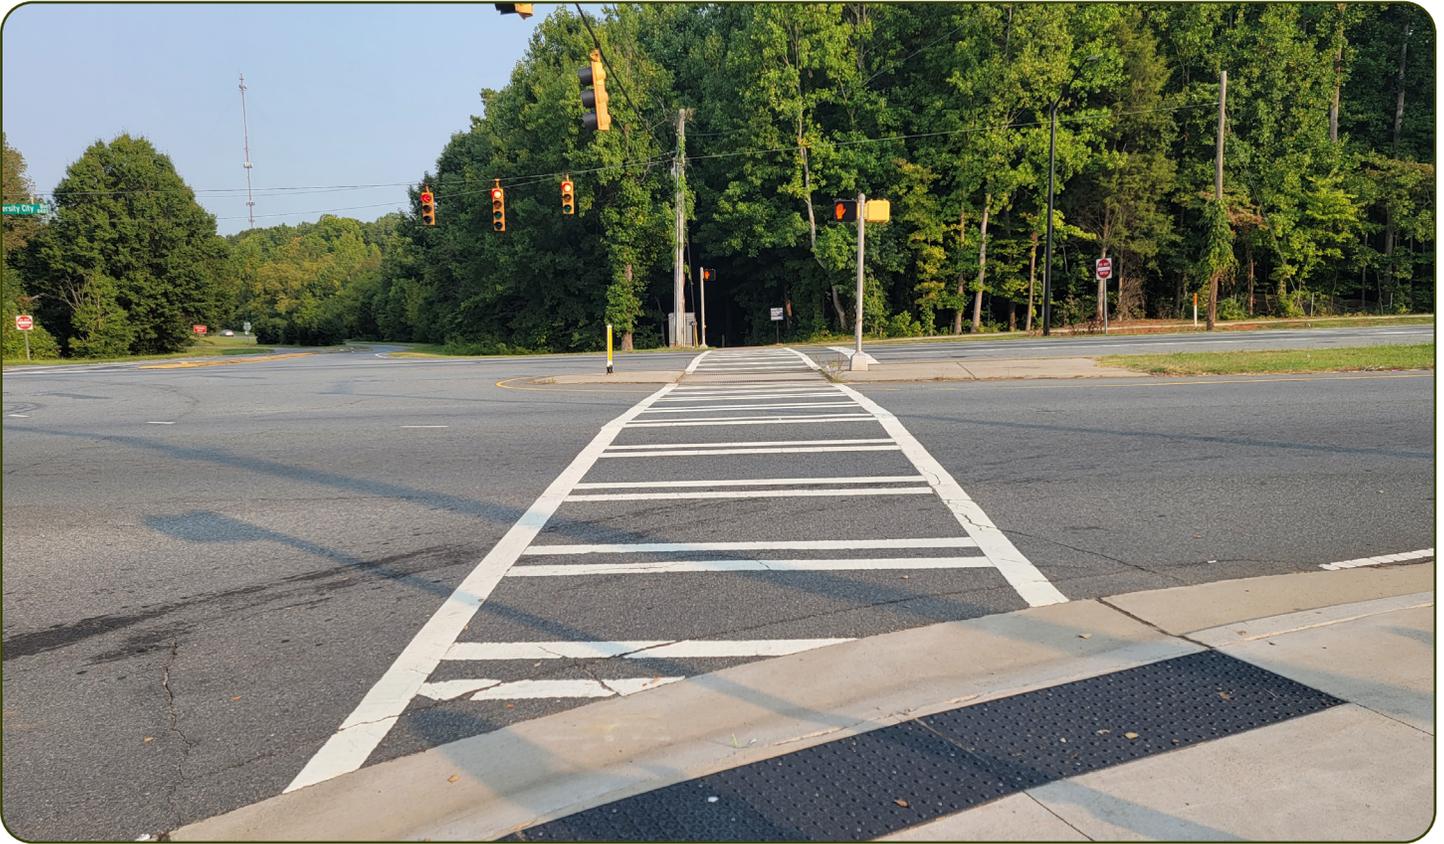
Trail crossing at a complex intersection with a wide refuge.
